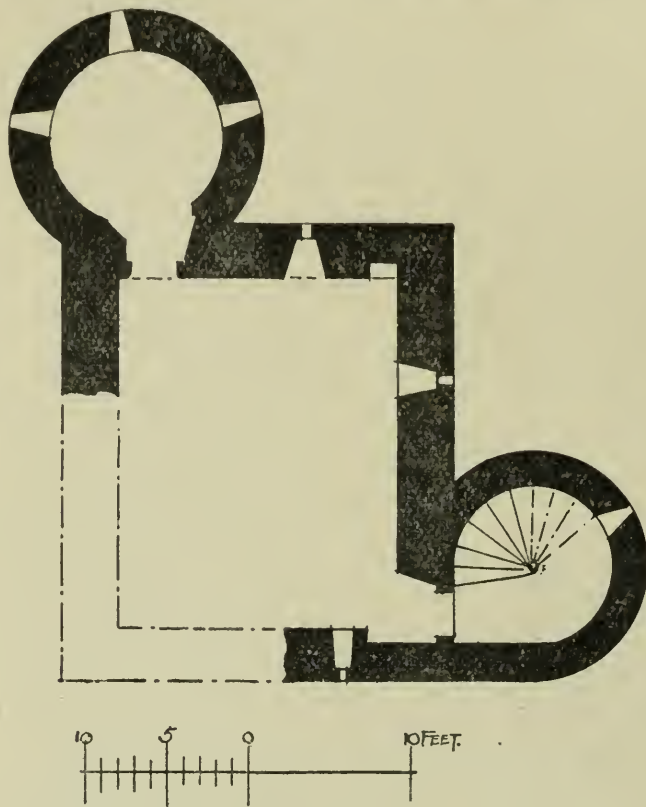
Keiss Castle (No. 498) ; Ground-plan.
